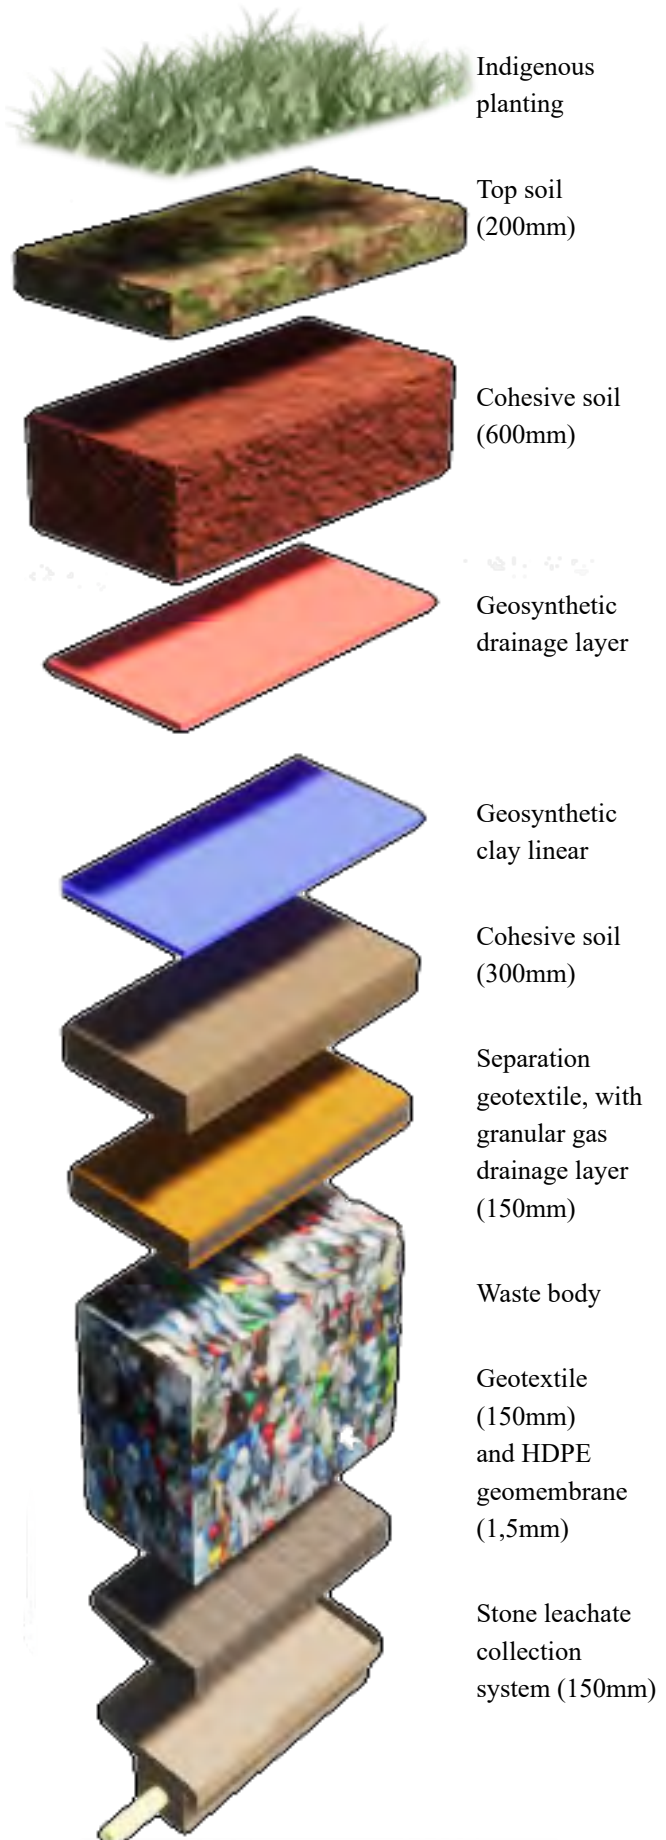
Typical layers of a B-Class landfill site (Author, 2020)
